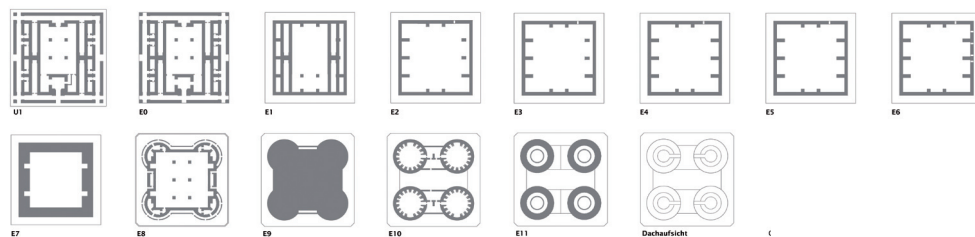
Multiple layers: ground plans and roof views of the former air raid bunker before the conversion
